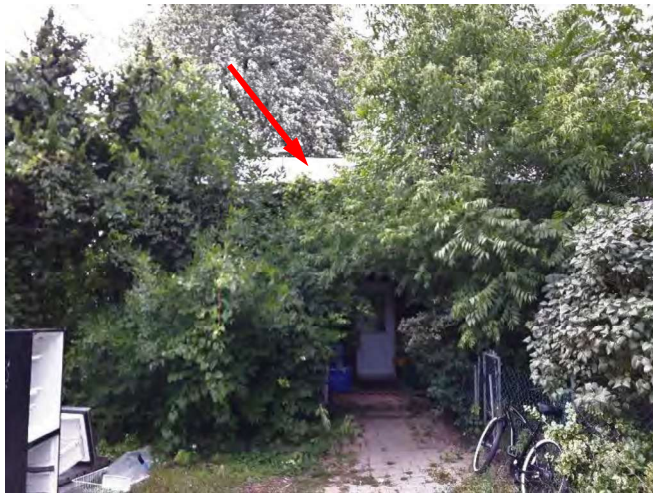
View of a portion of the southeast elevation (see arrow) of the Subject Building, looking northwest.
